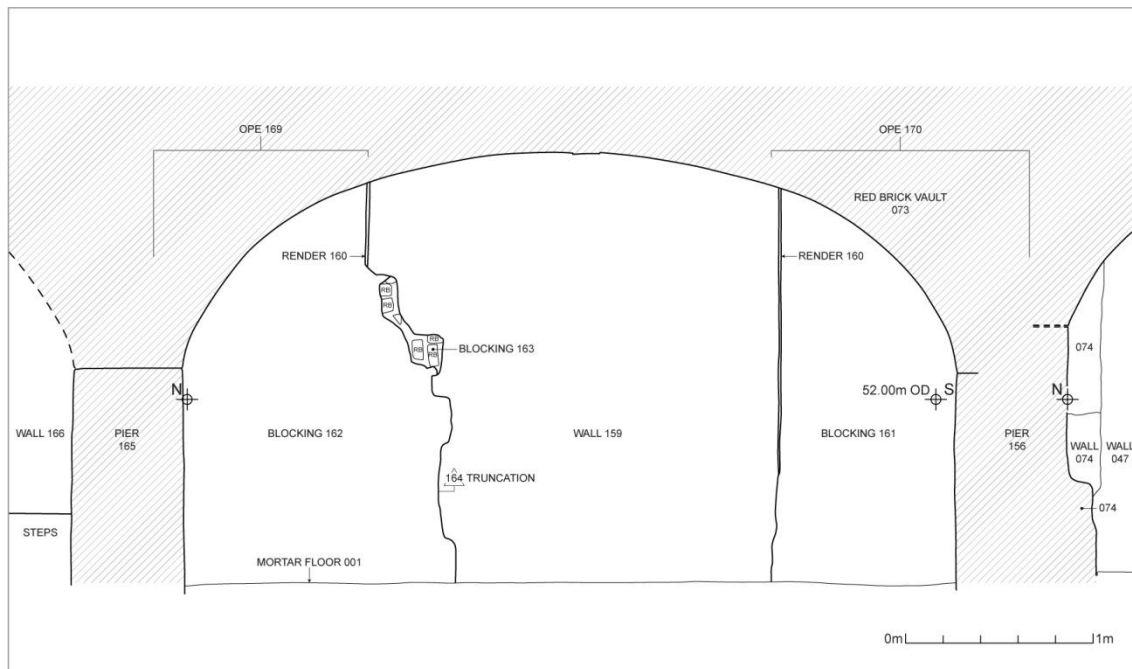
West facing section of the wall 159 and blocking walls 161 and 162
